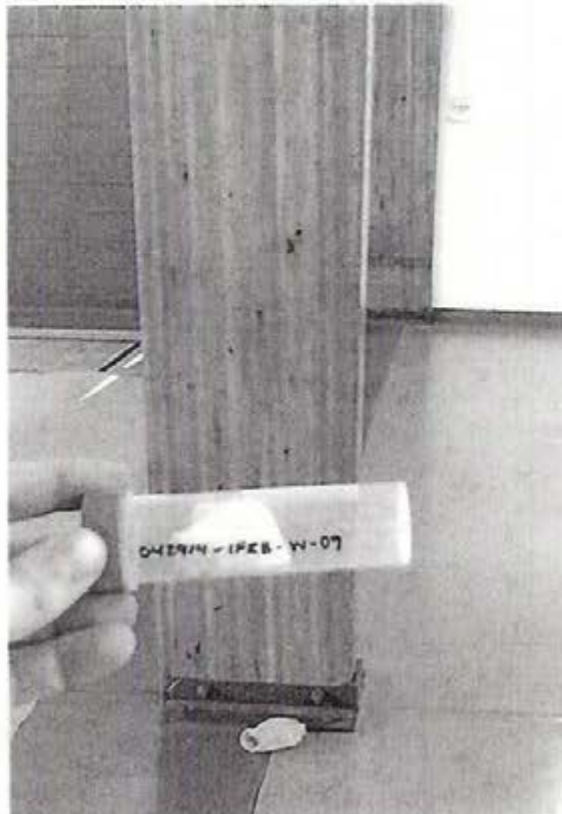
Lead wipe sample (042914-IFRB-W-09) collected from a vertical wood column; east end of hallway.
